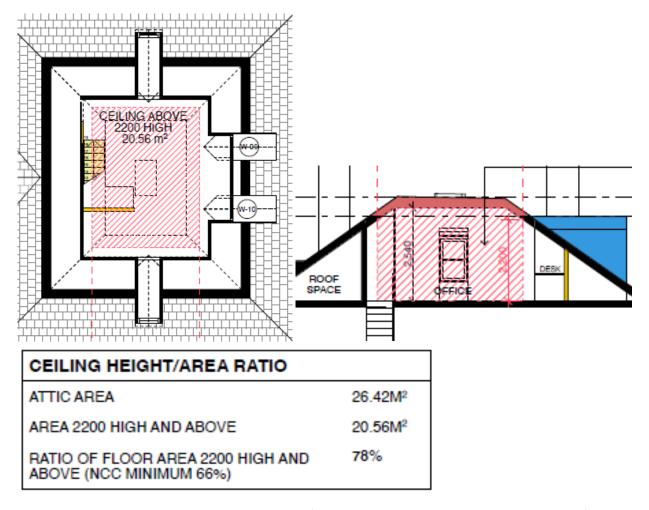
Floor-to-ceiling height calculation plan. (Source: MCK Architecture and Interiors, 2022)
